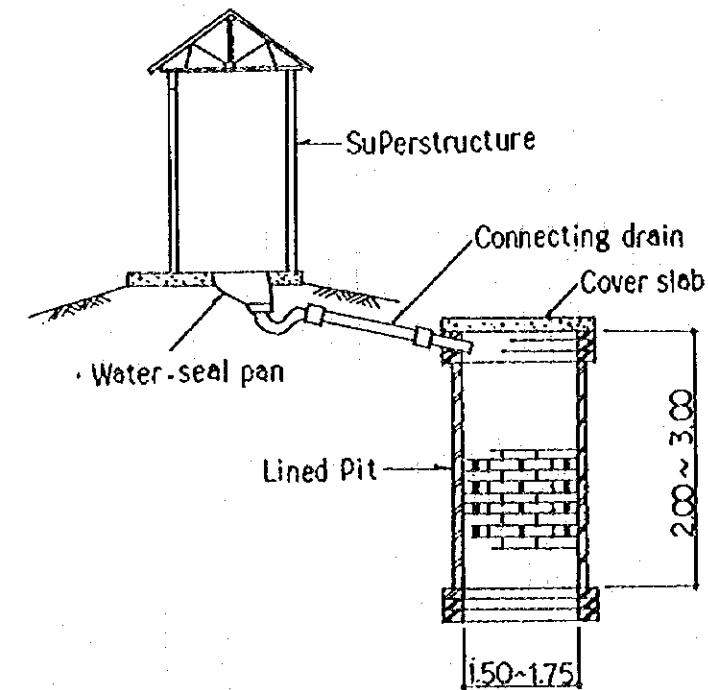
Layout of Household Waste Water Disposal Pit & Toilet
